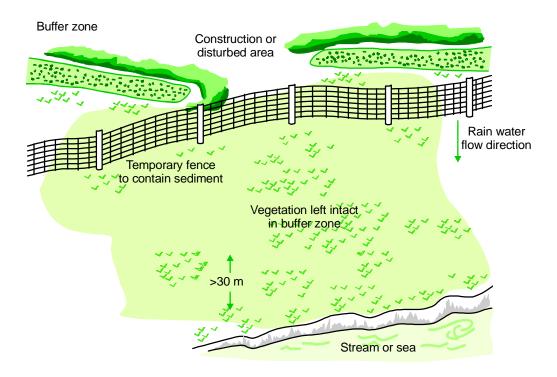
Fencing and vegetative buffers protect streams and seas from the effects of soil runoff from construction sites (EPS 1999)
